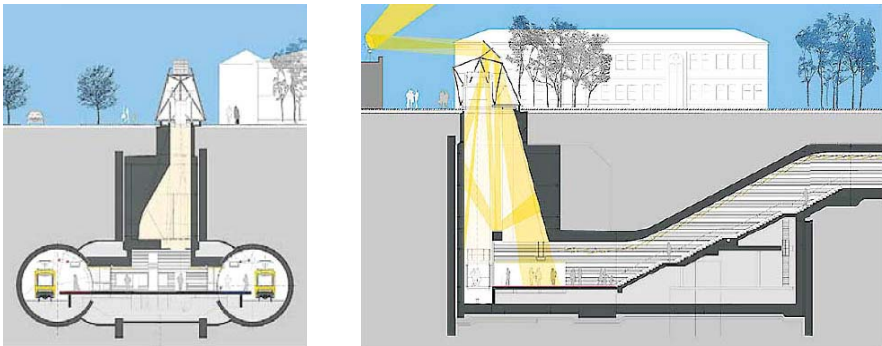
Cross and Longitudinal section of the underground station, Altenessen.
